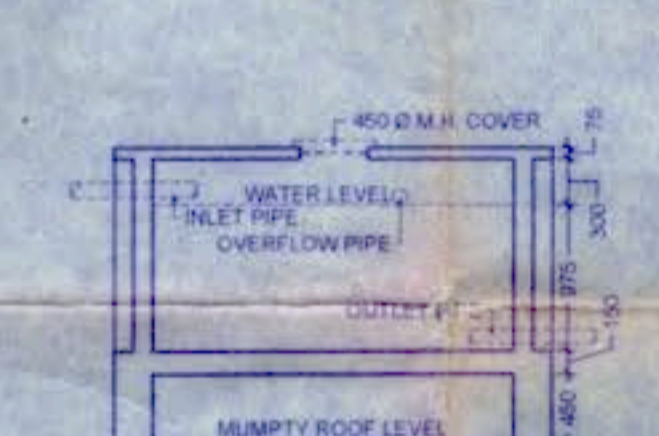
DETAIL OF OVERHEAD WATER RESERVOIR (BLOCK-3)
